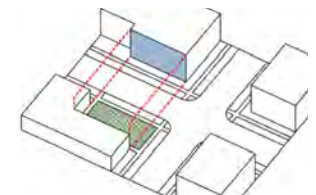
Building Massing and Articulation Correlates to Public Space
